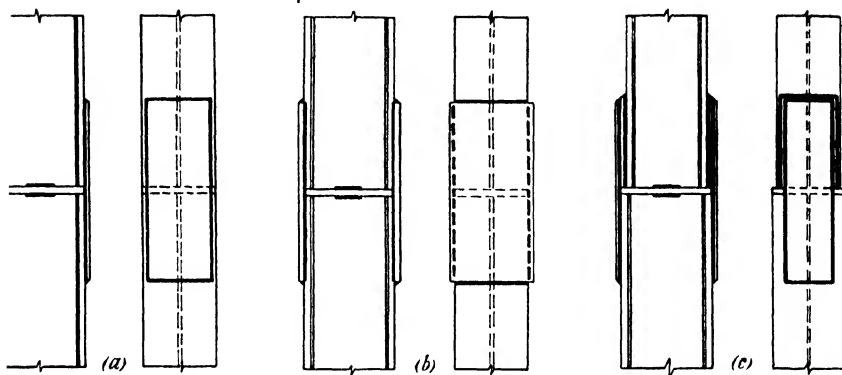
STANCHION SPLICES WITH COVER PLATES
